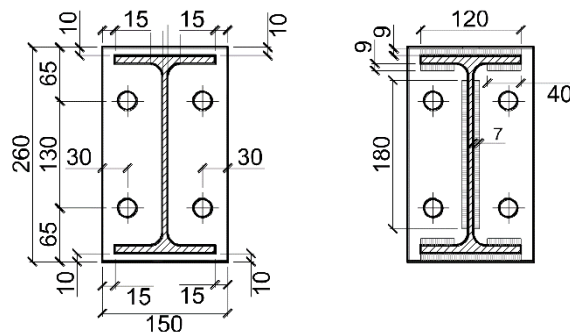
Detail of the beam-to-column steel connection (measures in mm): position of the beam (on the left) and main dimensions of the welds (on the right)
